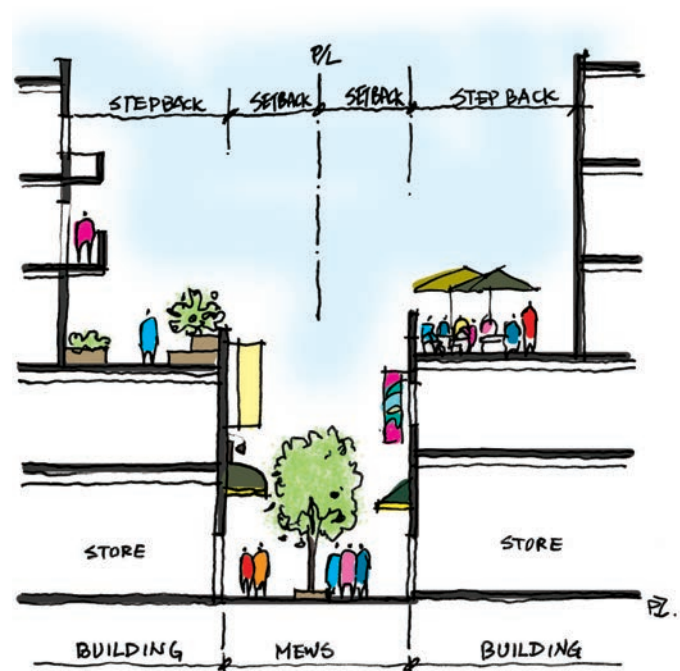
Centre Street - Side step-backs as elevated amenity spaces (4.4.3.4.f) example
